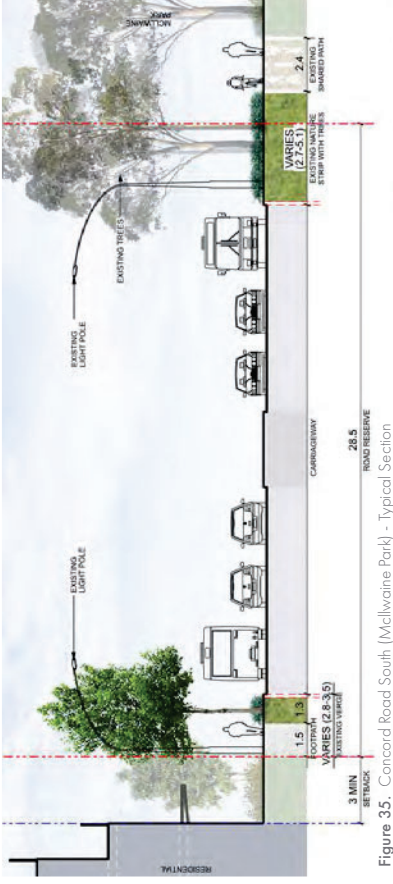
Concord Road South (McIlwaine Park) - Typical Section
